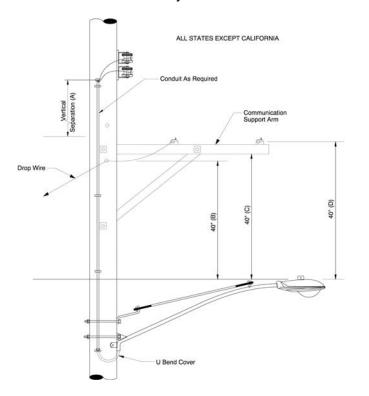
Street Lighting Facilities Below Communication Open Wire Crossarm
